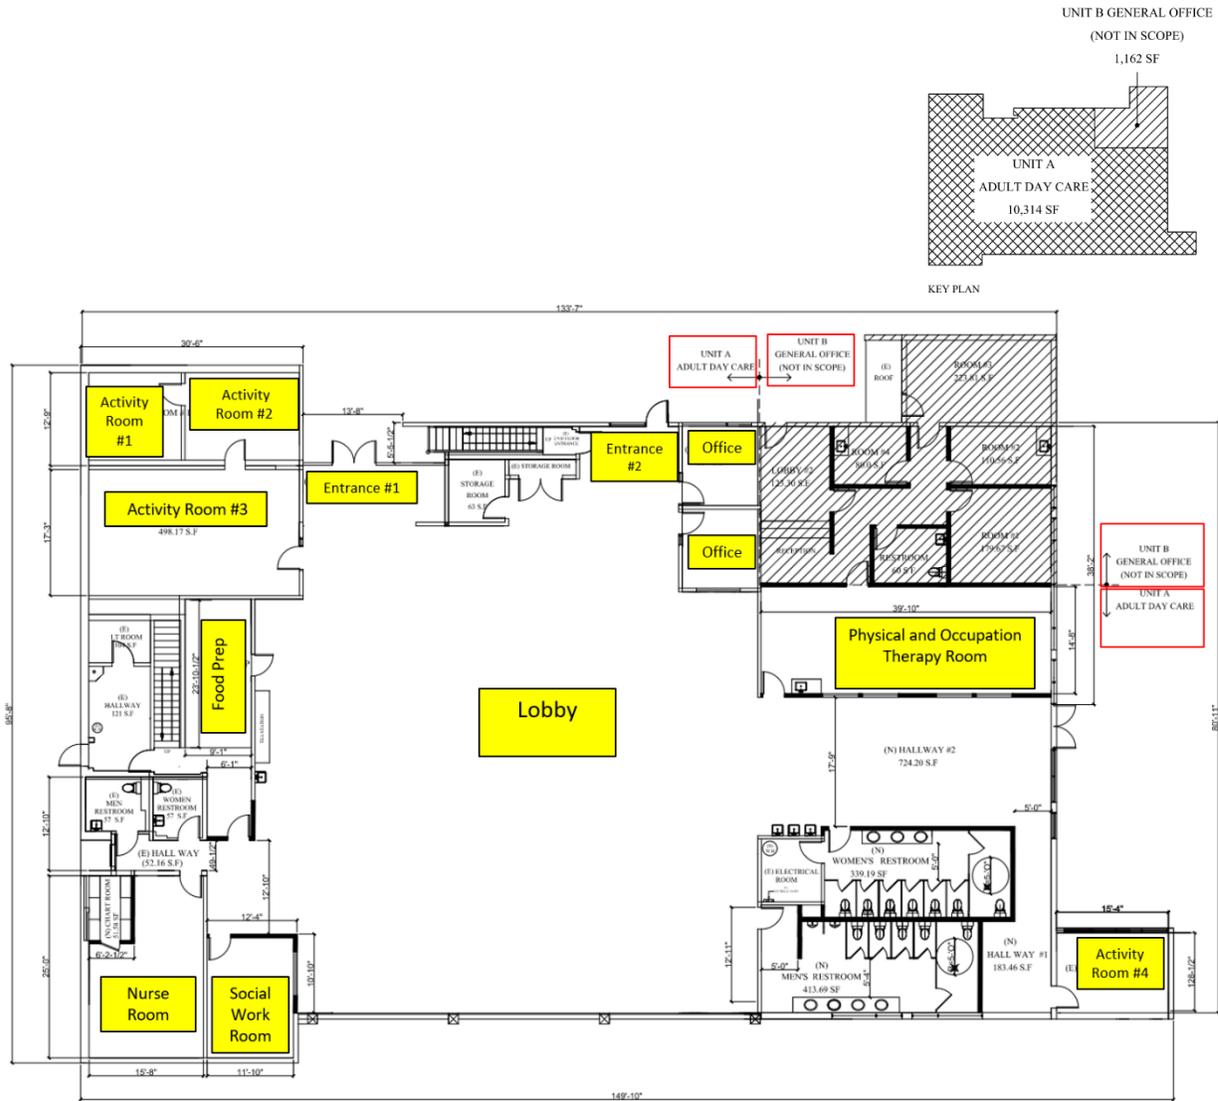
Exhibit C: PROPOSED FLOOR PLAN – 1ST FLOOR
